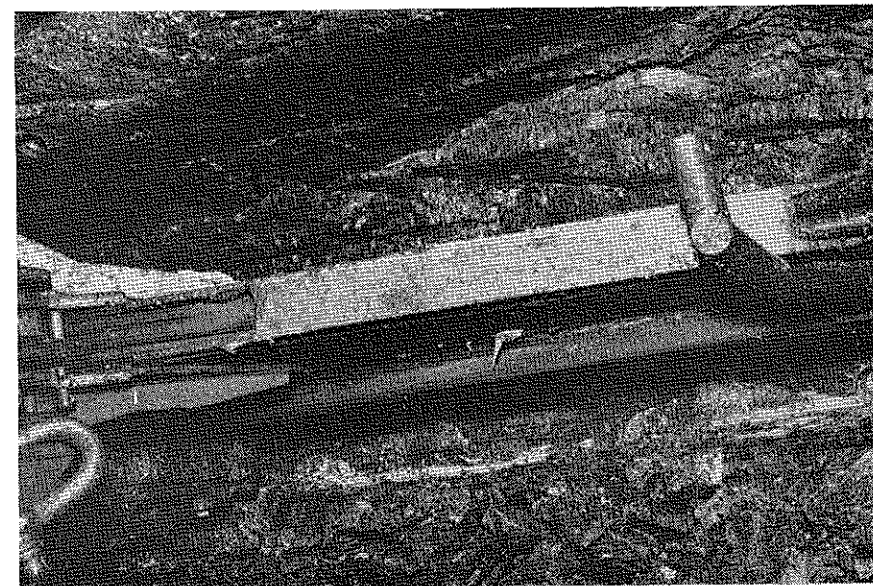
First Pass by the Rock Cutter. Note the drill holes used at the ends of the cutting path. Doornfontein Gold Mine, South Africa.
